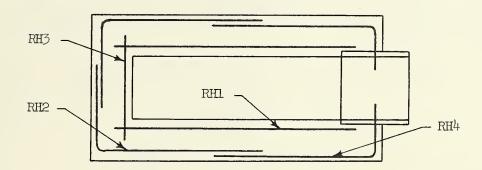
Layout of horizontal steel in sections at the conduit entrance.
